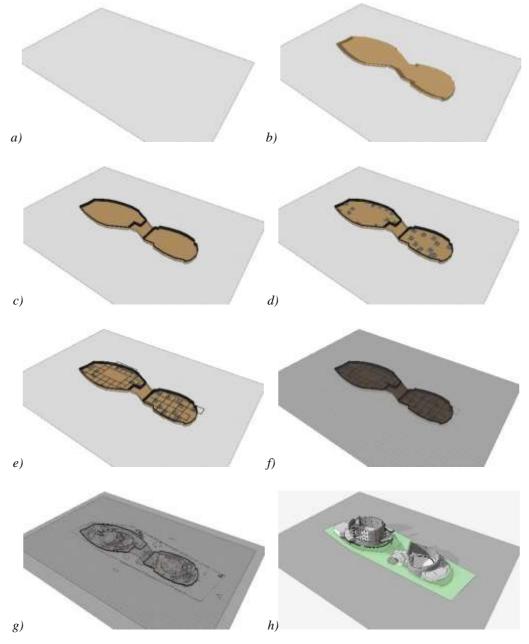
Floating Foundation Workflow. a) Ground Level, b) Excavation of Soil Weight ≥ Building Weight, c) Peripheral Retaining Wall & Thin raft with inverted beam at base, d) Column erected from inverted beam based on column layout, e) Tie Beam at Ground Level, f) Flooring, g) Ground Level, h) Super Structure
